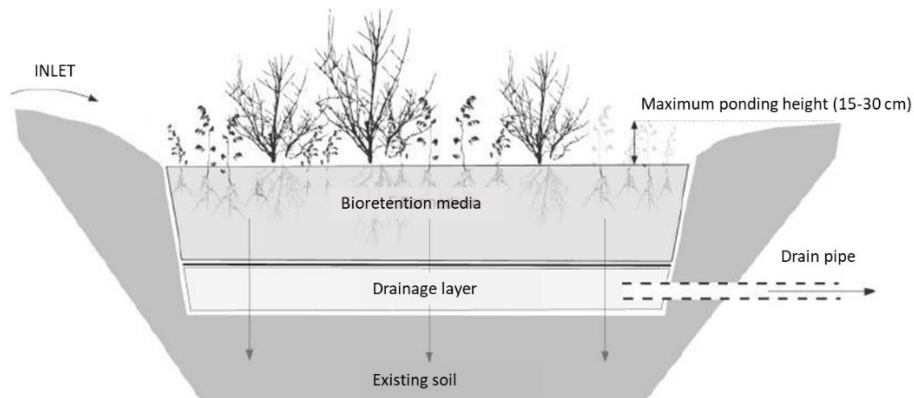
Raingarden construction type 1, where existing soil is changed to bioretention media of choice and drainage layer under (Paus & Braskerud, 2013).
